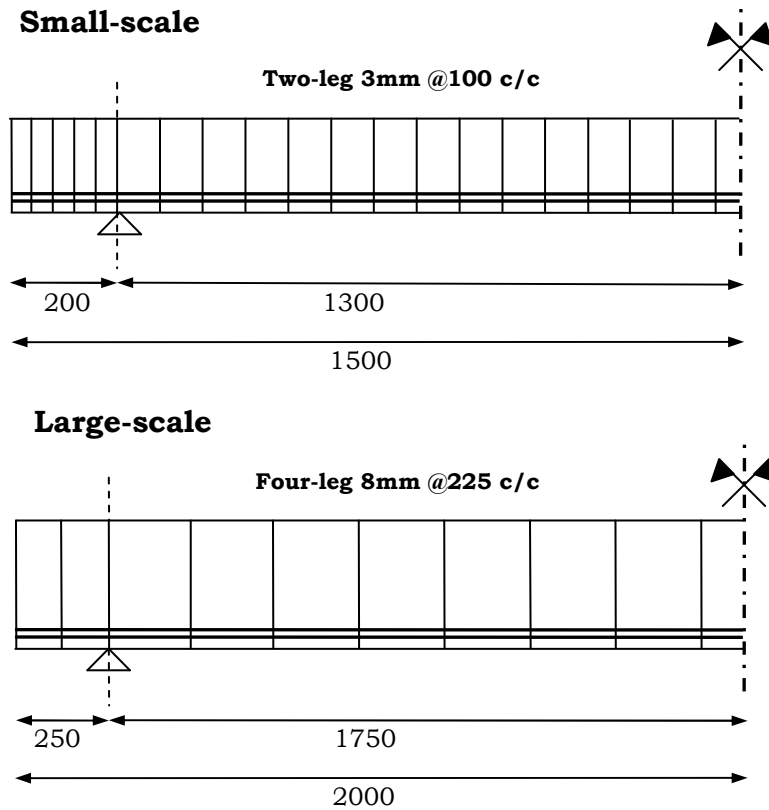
Elevation of the test beams showing the layout of stirrups (in mm)
